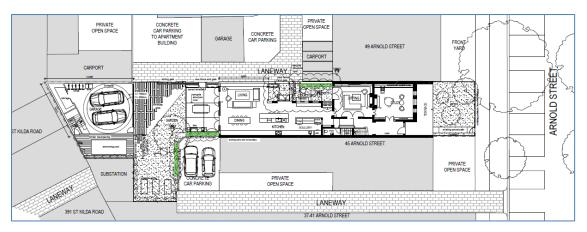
Extract of proposed ground floor plan (Source: applicant)
